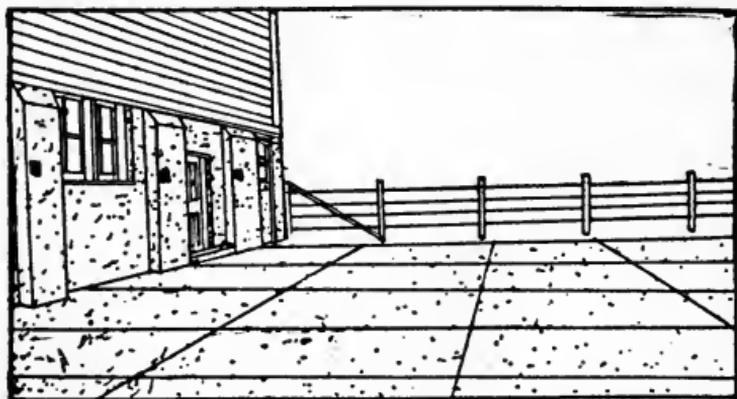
Concrete Barnyard, Laid in Blocks Like a Sidewalk
